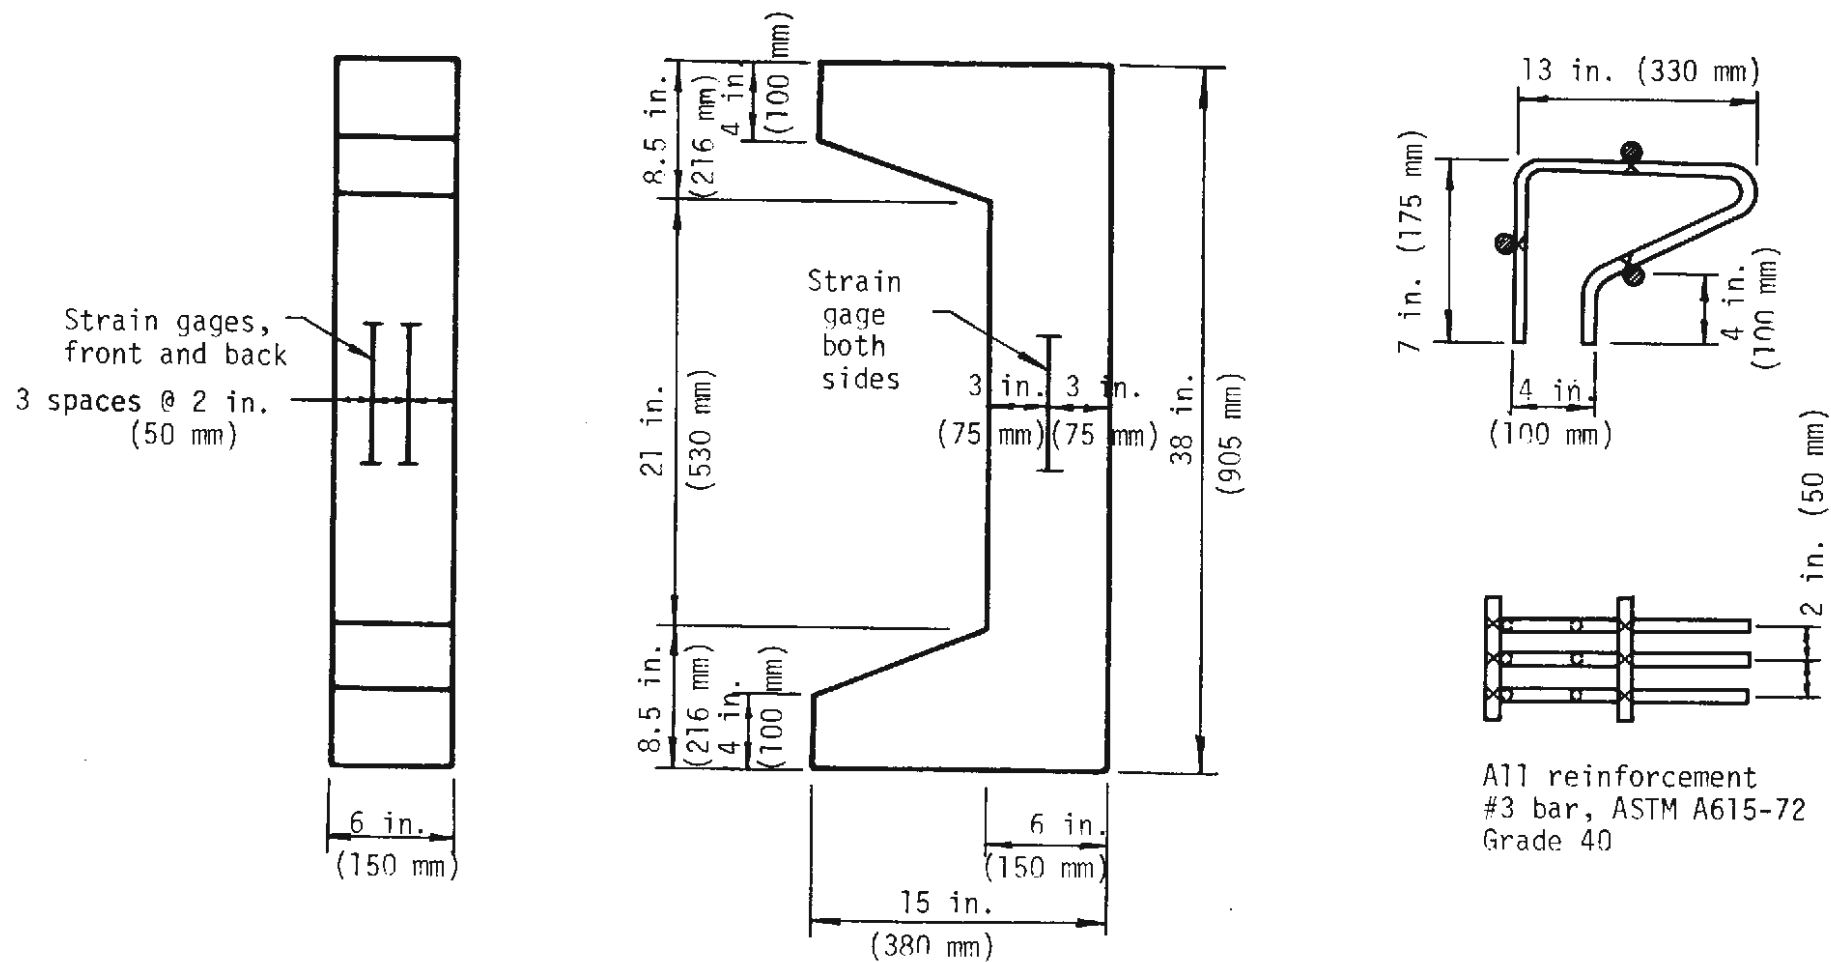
DETAILS OF BEAM-COLUMN AND CAPITAL REINFORCEMENT
